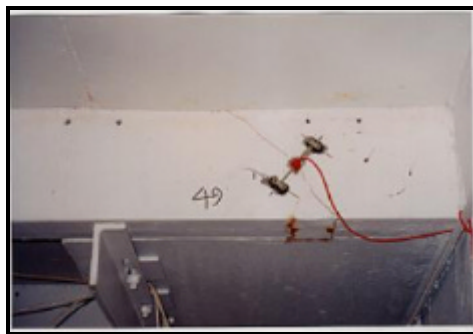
Shear cracks (Source: <http://www.peterlindsell.co.uk>)
